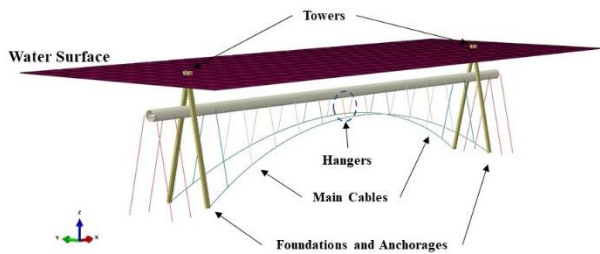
Submerged floating tunnel with suspension support (SFTSS)
